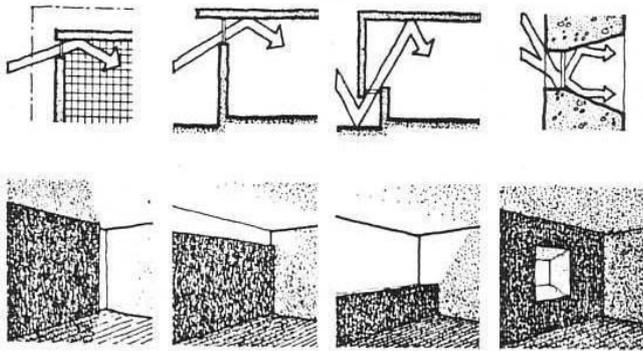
Daylight pattern of side windows and controlling outdoor glare [1].
